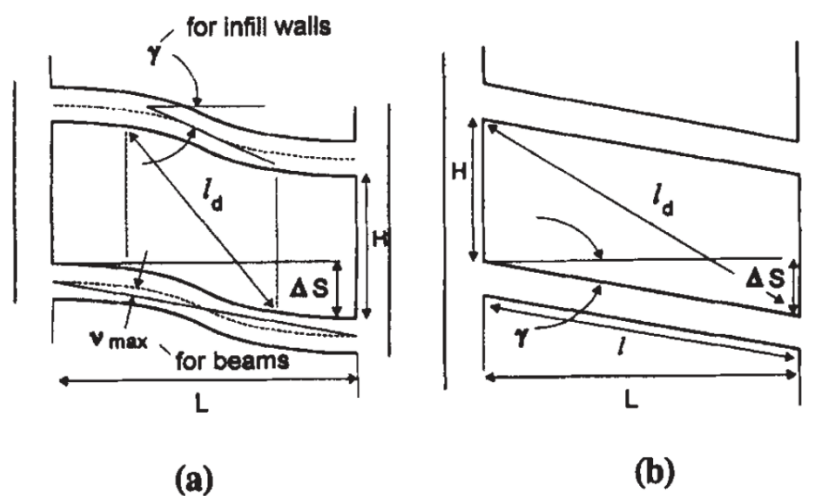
Geometry of beams and infill/panel walls: (a) Fixed end beam frame; (b) Simple beam frame (Boone, 1996).
